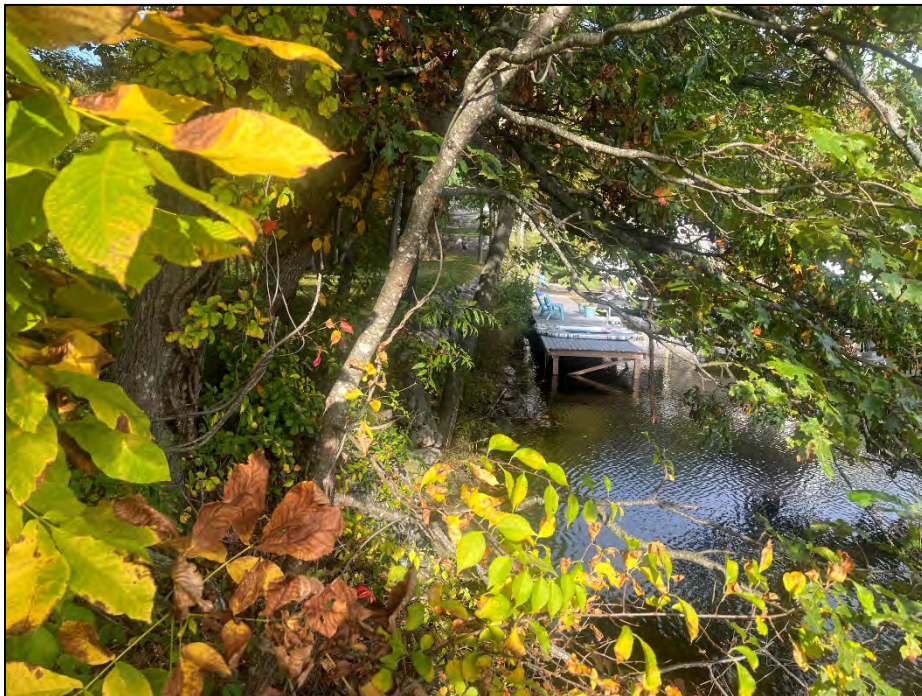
West Dike - Upstream side as viewed from near STA D0+00 looking right.
